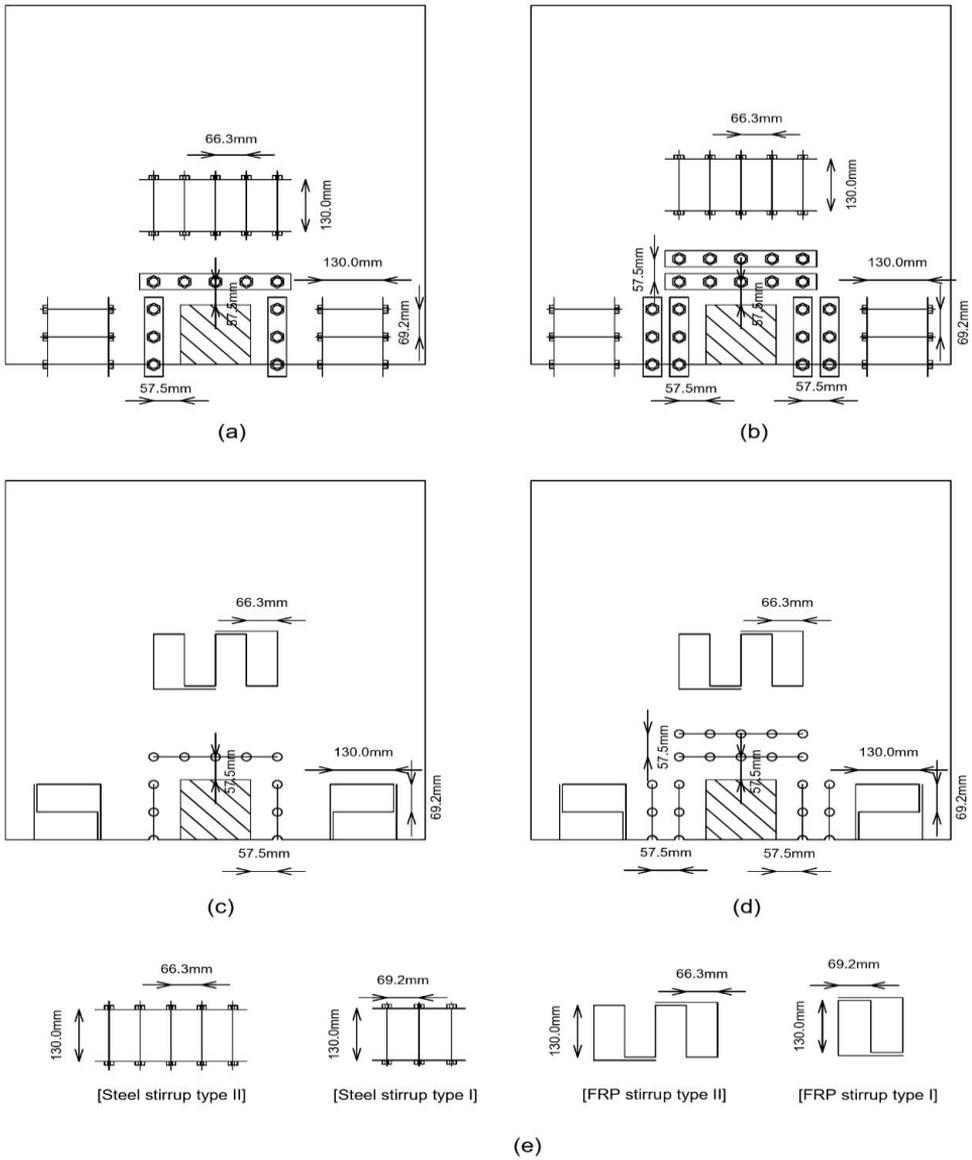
Strengthening systems details; steel links using one row (a), two rows of steel (b), Using one row of FRP stirrups (c), Using two rows of FRP stirrups (d) stirrups types details (e).
